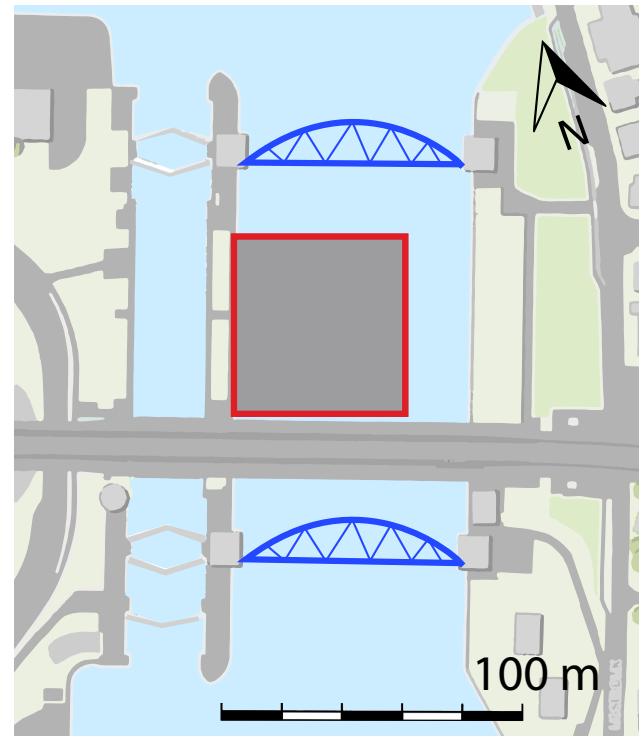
Step 3 & 4: Pour underwater concrete (dark grey) and dewater building pit.
